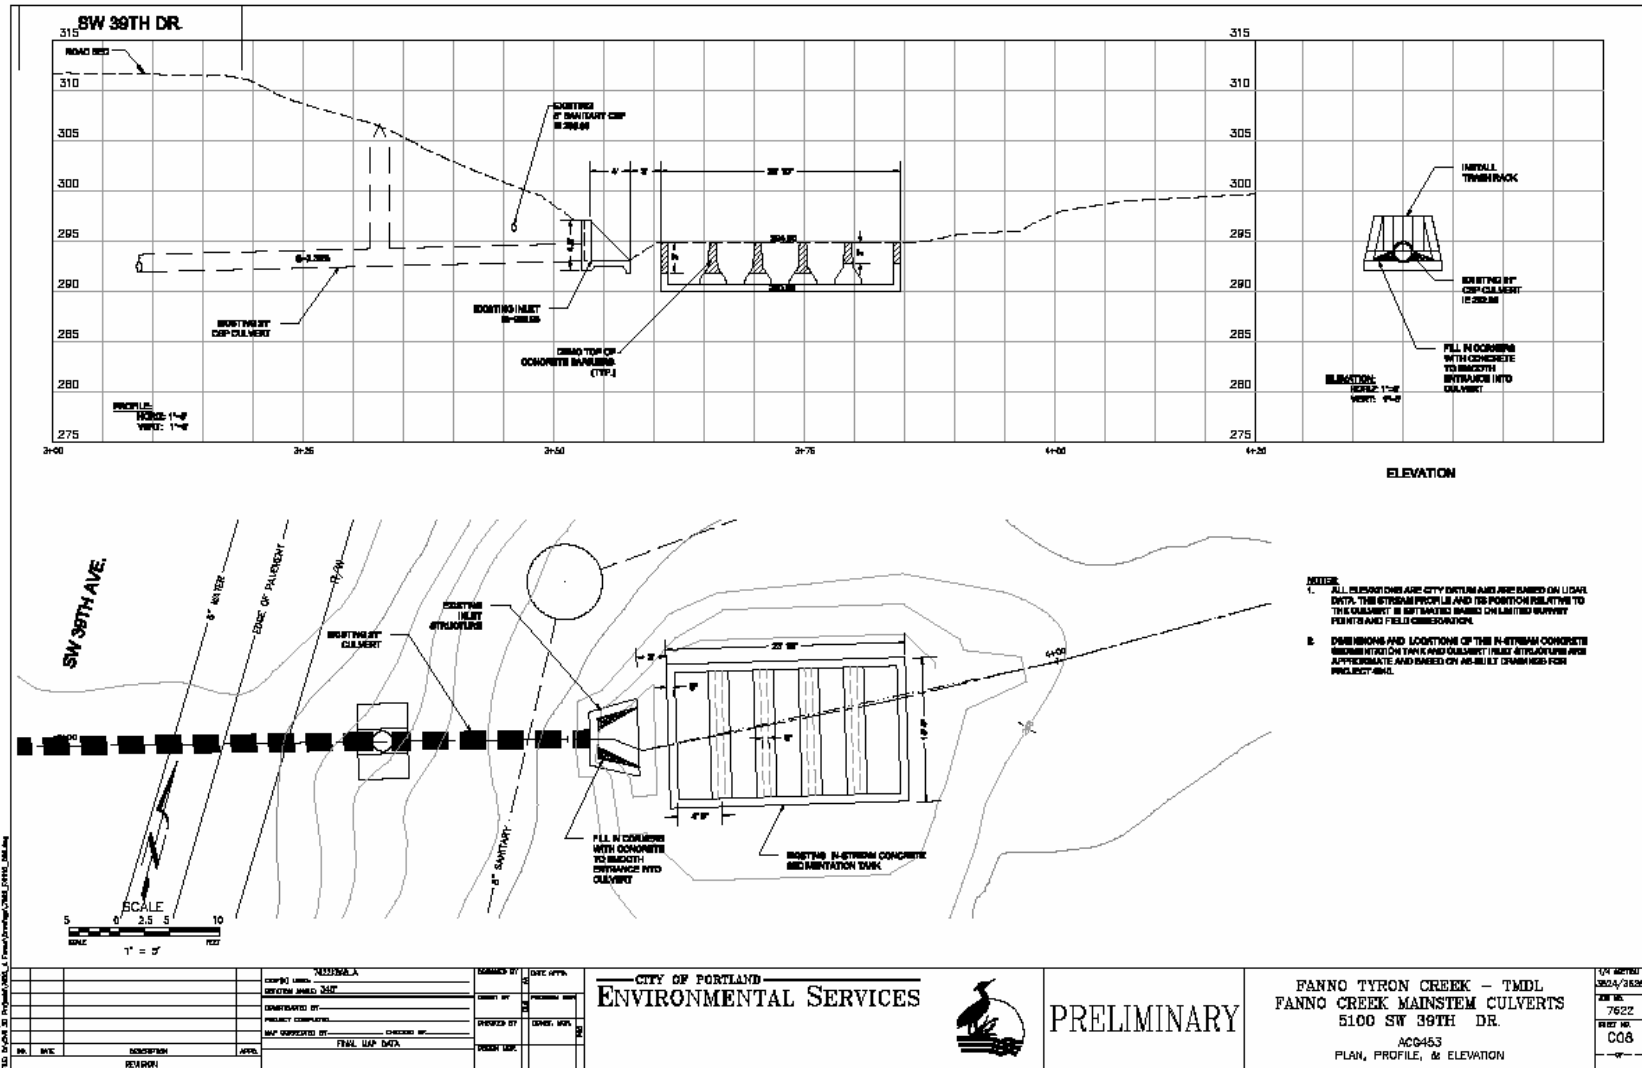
SW 39th Culvert Pre-design Plan and Profile
